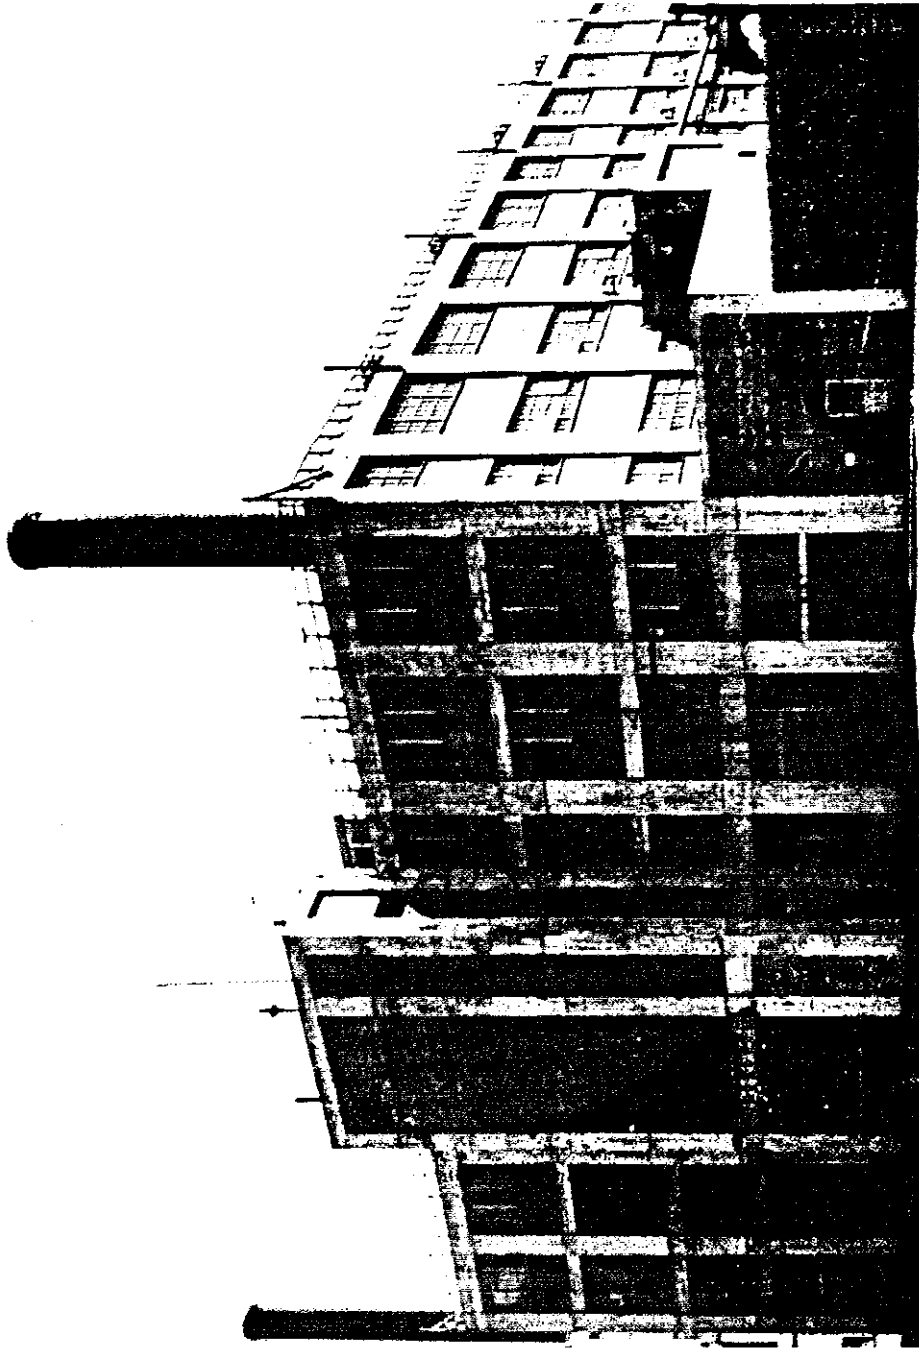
The Acetic-Anhydride Production Plant (Building 7) is typical of the reinforced-concrete-and-brick construction used in Plant-A manufacturing facilities. (Source: "Industrial Facilities Inventory," Part 1, Section 7, unpublished, prepared by U. S. Army Corps of Engineers, 1944, HSAAP Archives.)
